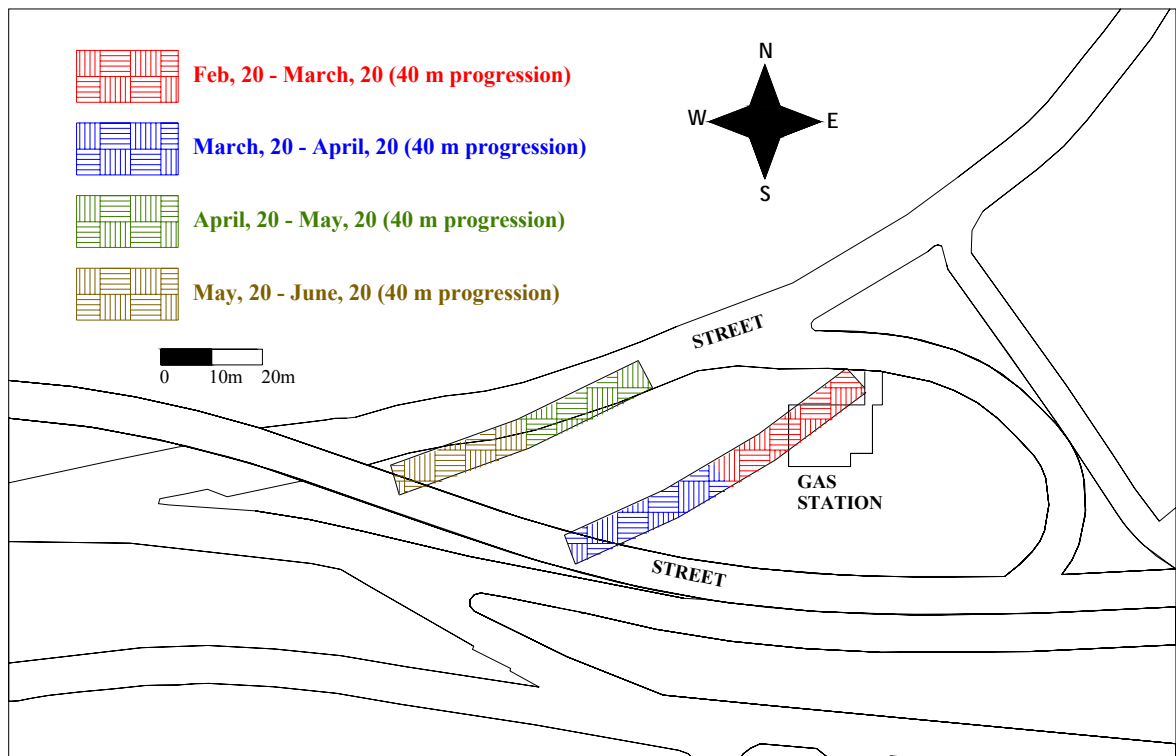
The time schedule for the tunnel construction work underneath the gas station site
